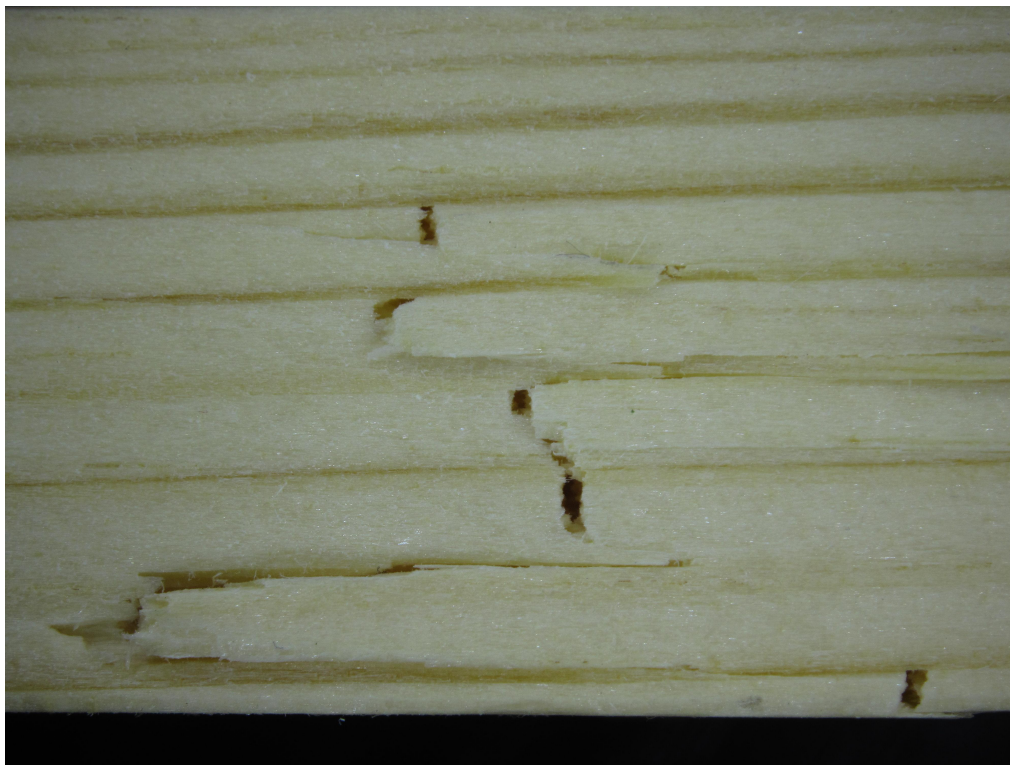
Local damage of Specimen 1 after bending test (bottom view)
